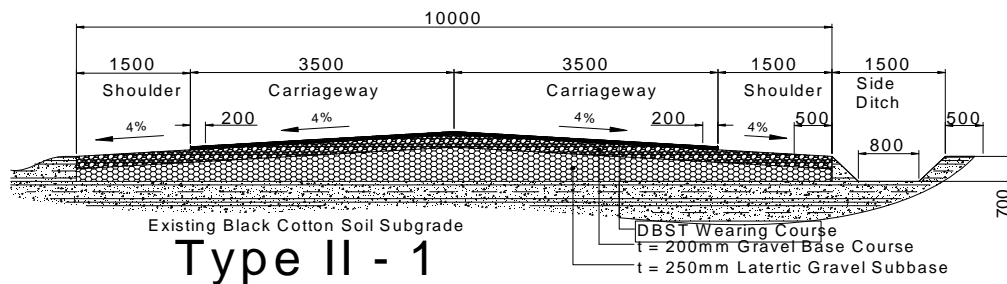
Typical Cross section of Type II-1 of the Juba River Port Access Road depicting the experimental trial section pavement structure without OPMC stabilization and without subgrade improvement, constructed in swampy areas with expansive Black Cotton Soils
